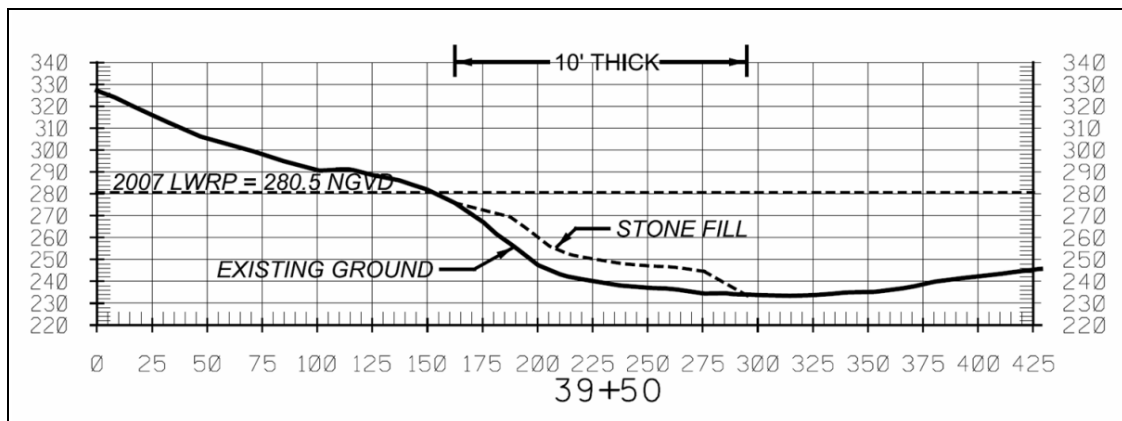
Cross Section of Proposed Repair at Cache-Cairo on the Ohio River
